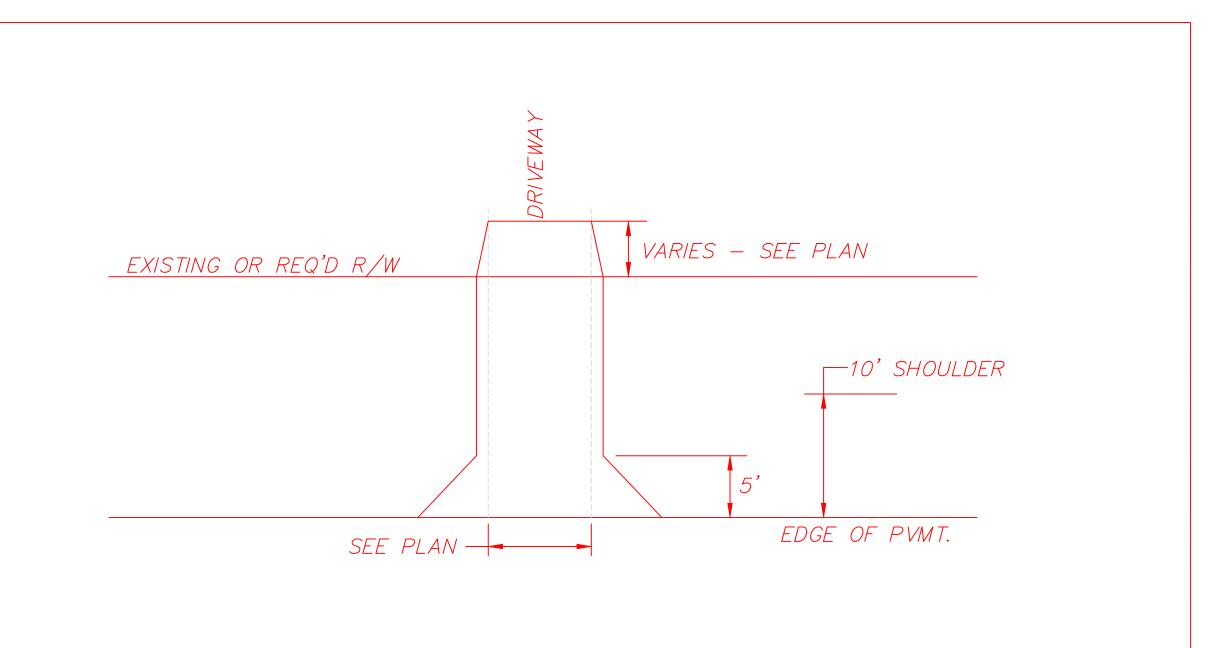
## DETAIL TO BE USED WHEN EXISTING PAVEMENT IS TO BE RESURFACED WITH TWO INCHES OR MORE OF ASPHALTIC CONCRETE
